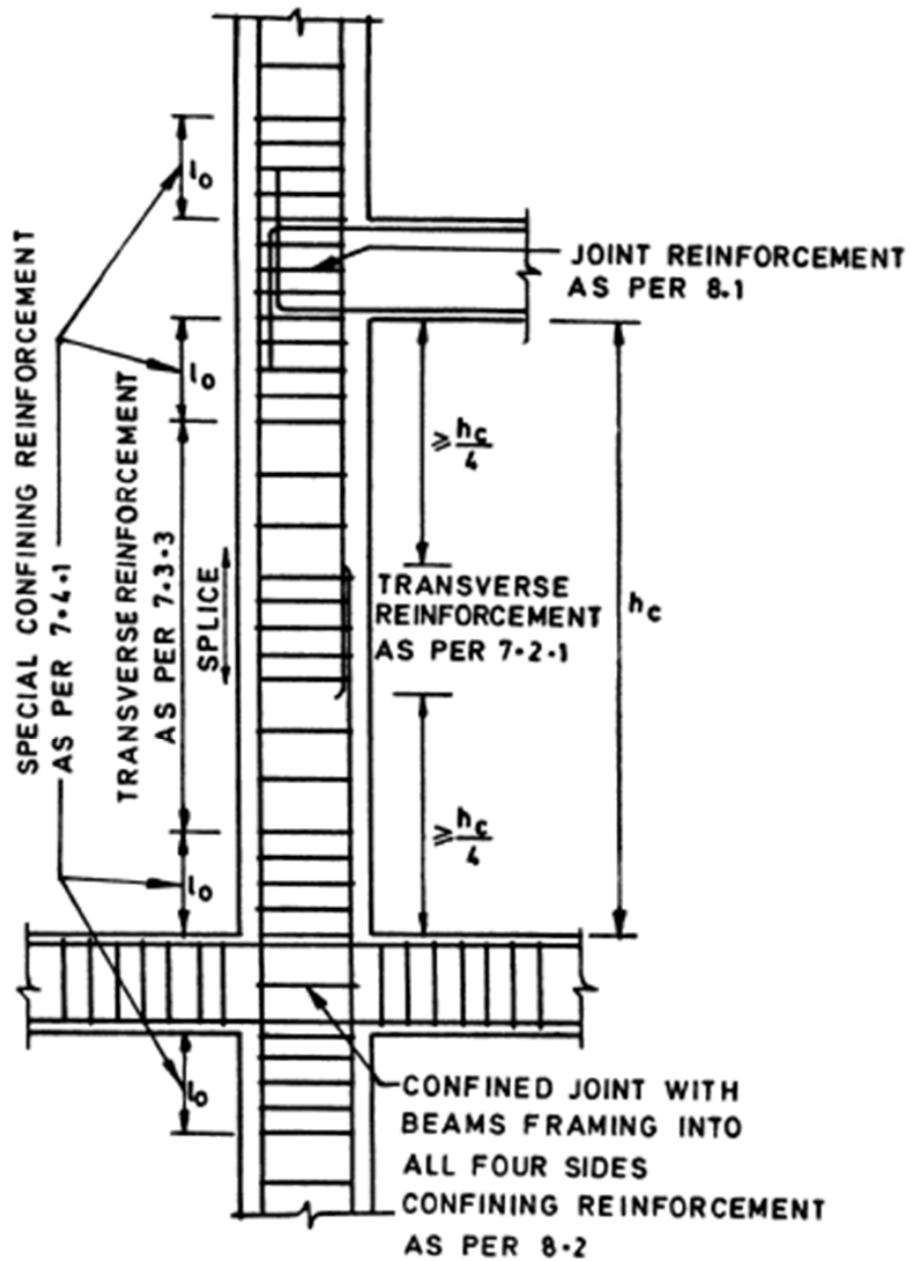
TRANSVERSE REINFORCEMENT IN COLUMN
